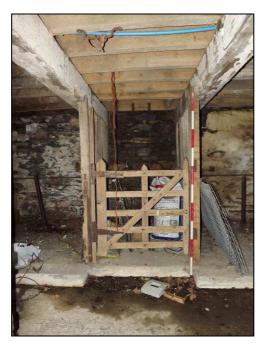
Detail of ladder to first floor, interior of shippon, Building B (Scale = 2m)
